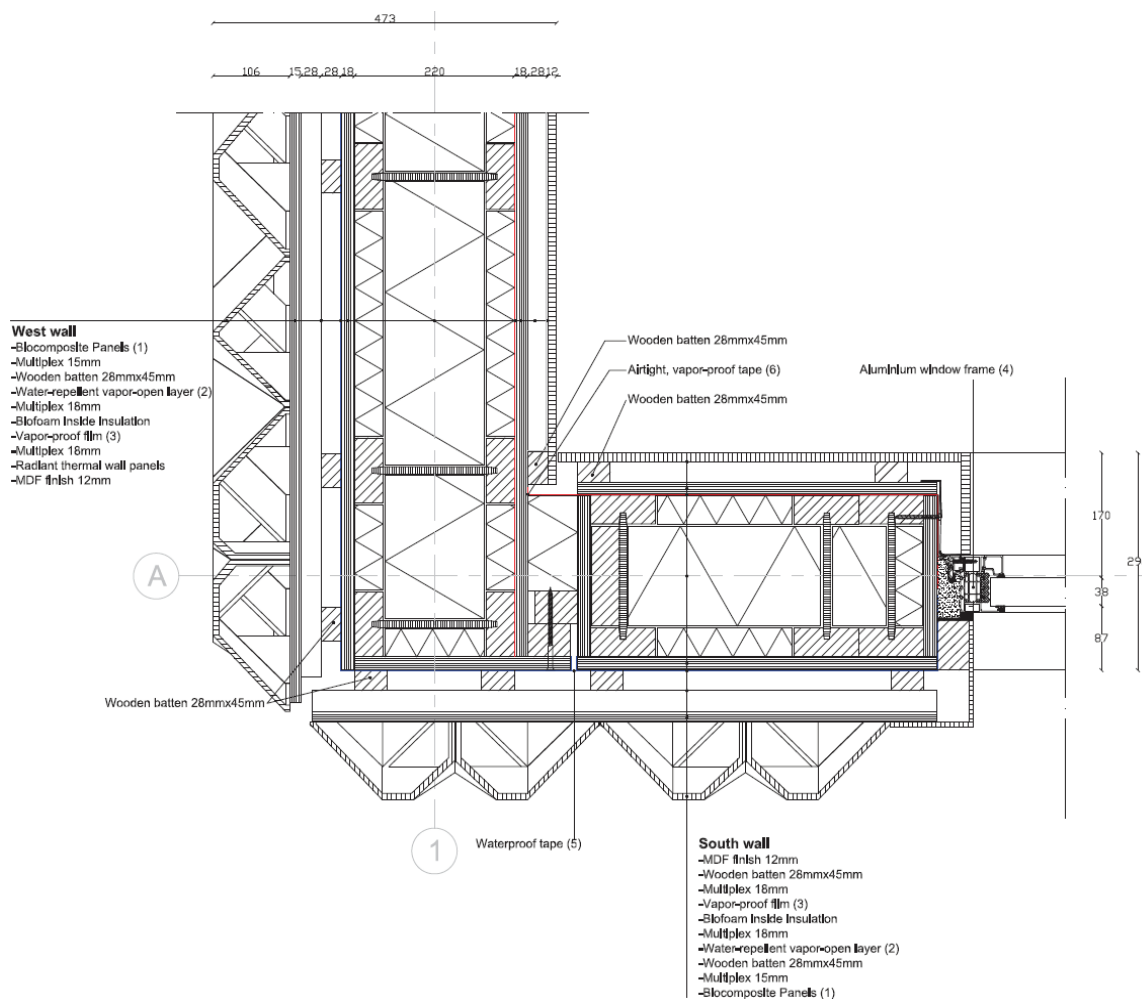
Detail of the West and South walls (Team VIRTUe 2018b).
